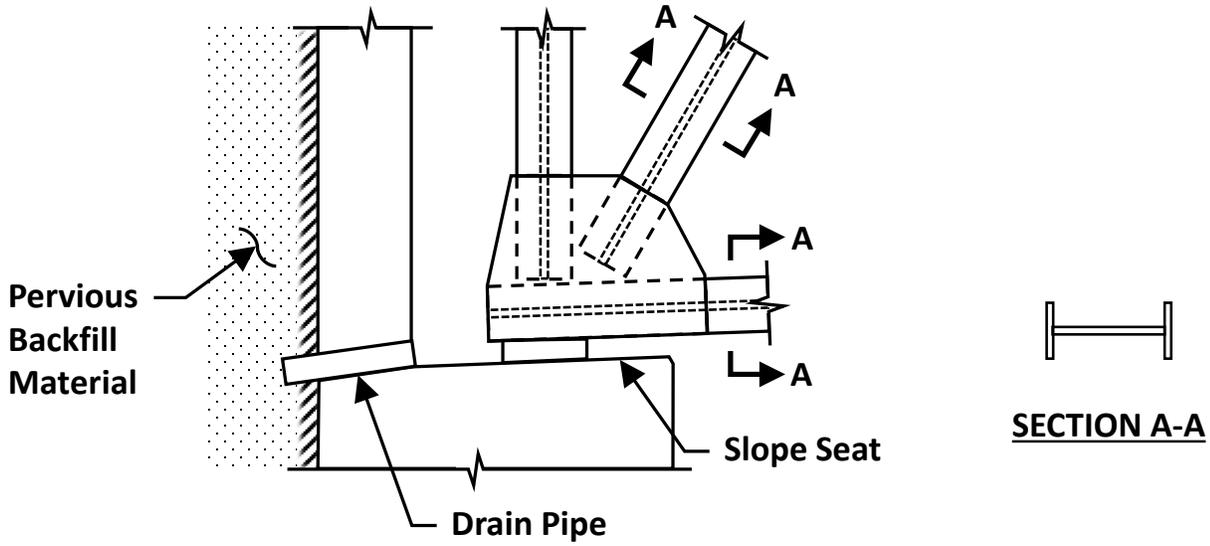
Example of sloping abutment seat and truss orientation for drainage.
